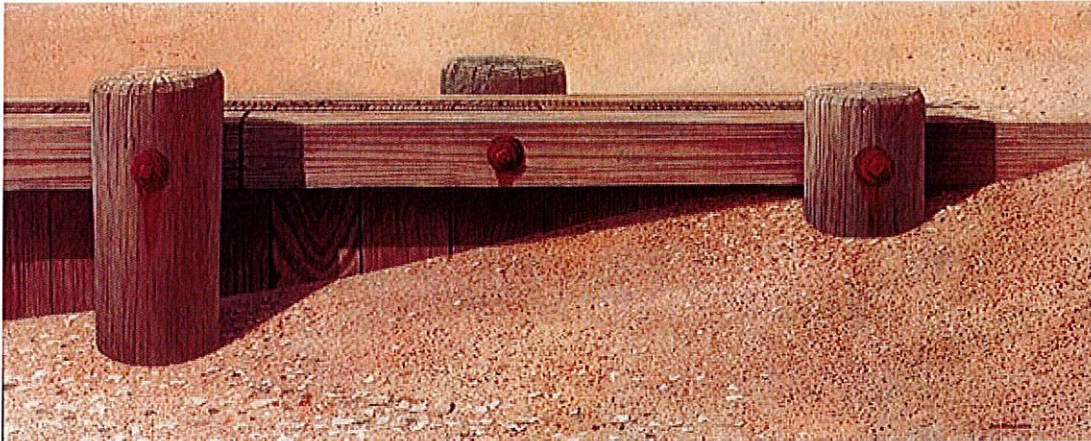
Example of a typical wooden groin that would be utilized as the trunk section of the T-head structures, where the armor stone shore parallel breakwater section would join the shore perpendicular wood section to form the 'T'. The trunk initially will be covered by sand, with a small portion near the breakwater uncovered. The coverage of the wooden trunks will fluctuate as the beach establishes an equilibrium profile.
